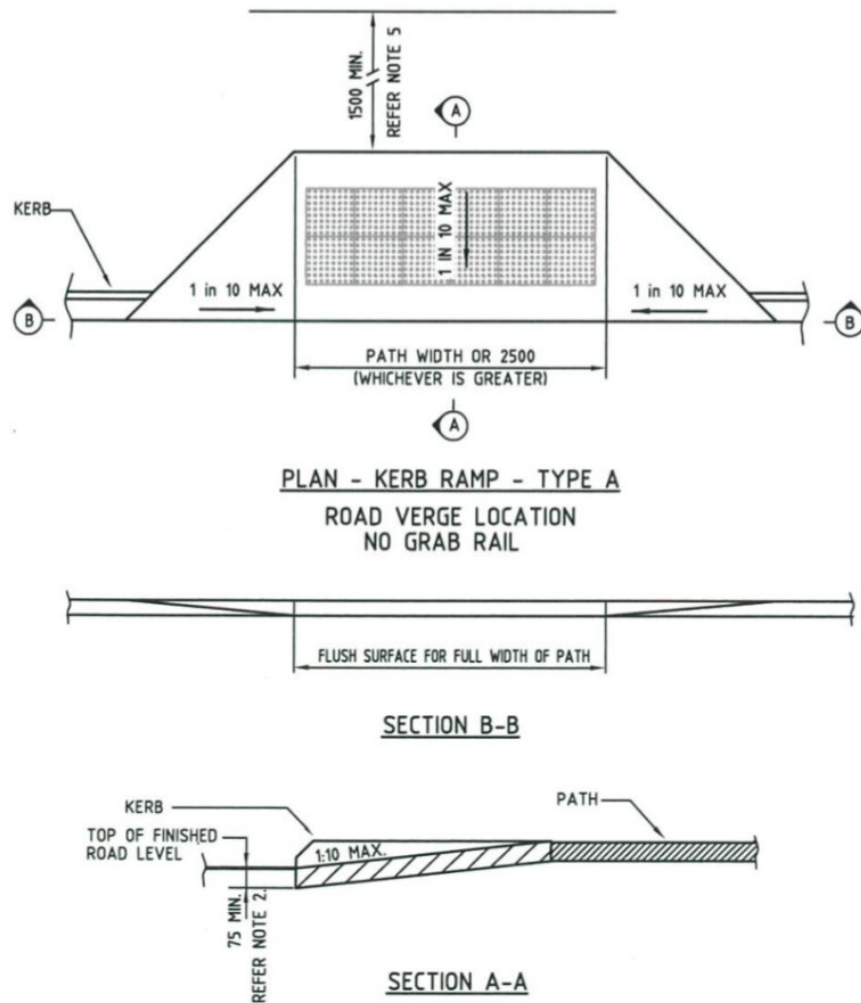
Kerb Ramp Design - (MRWA 9831-5649-3 Type A)
